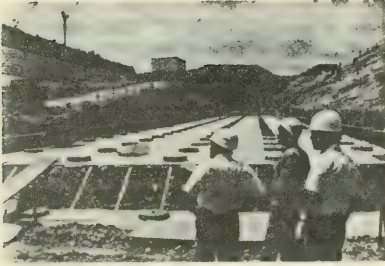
Construction work for one of the MR long straight sections to install rf cavities.
